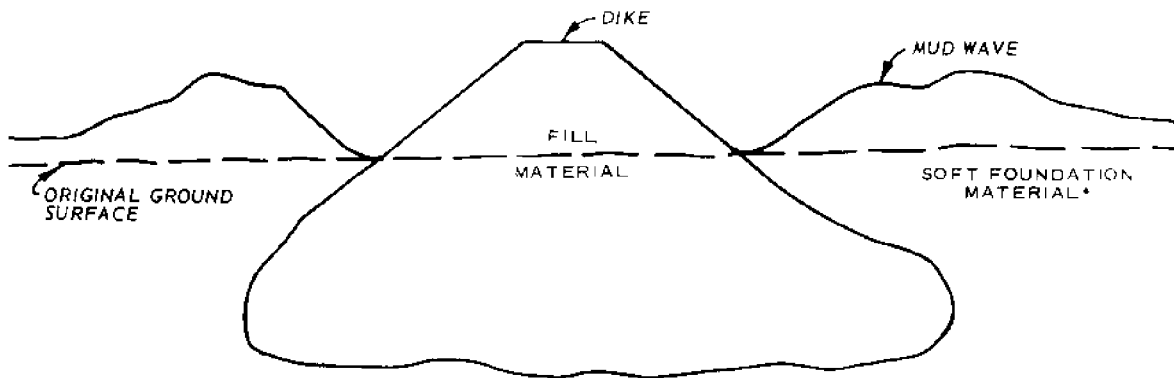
Typical Use of Excavation and Replacement Method to Improve Dike Stability
